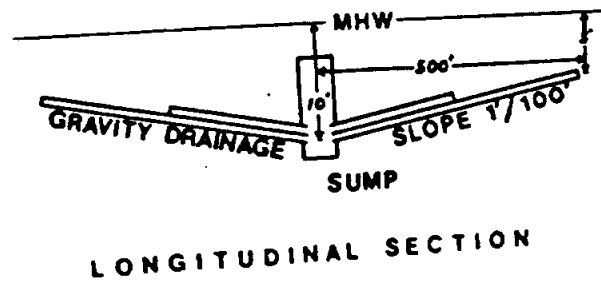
Longitudinal section parallel to beach (as viewed from sea) of buried pipes in relation to-MHW on beachface
